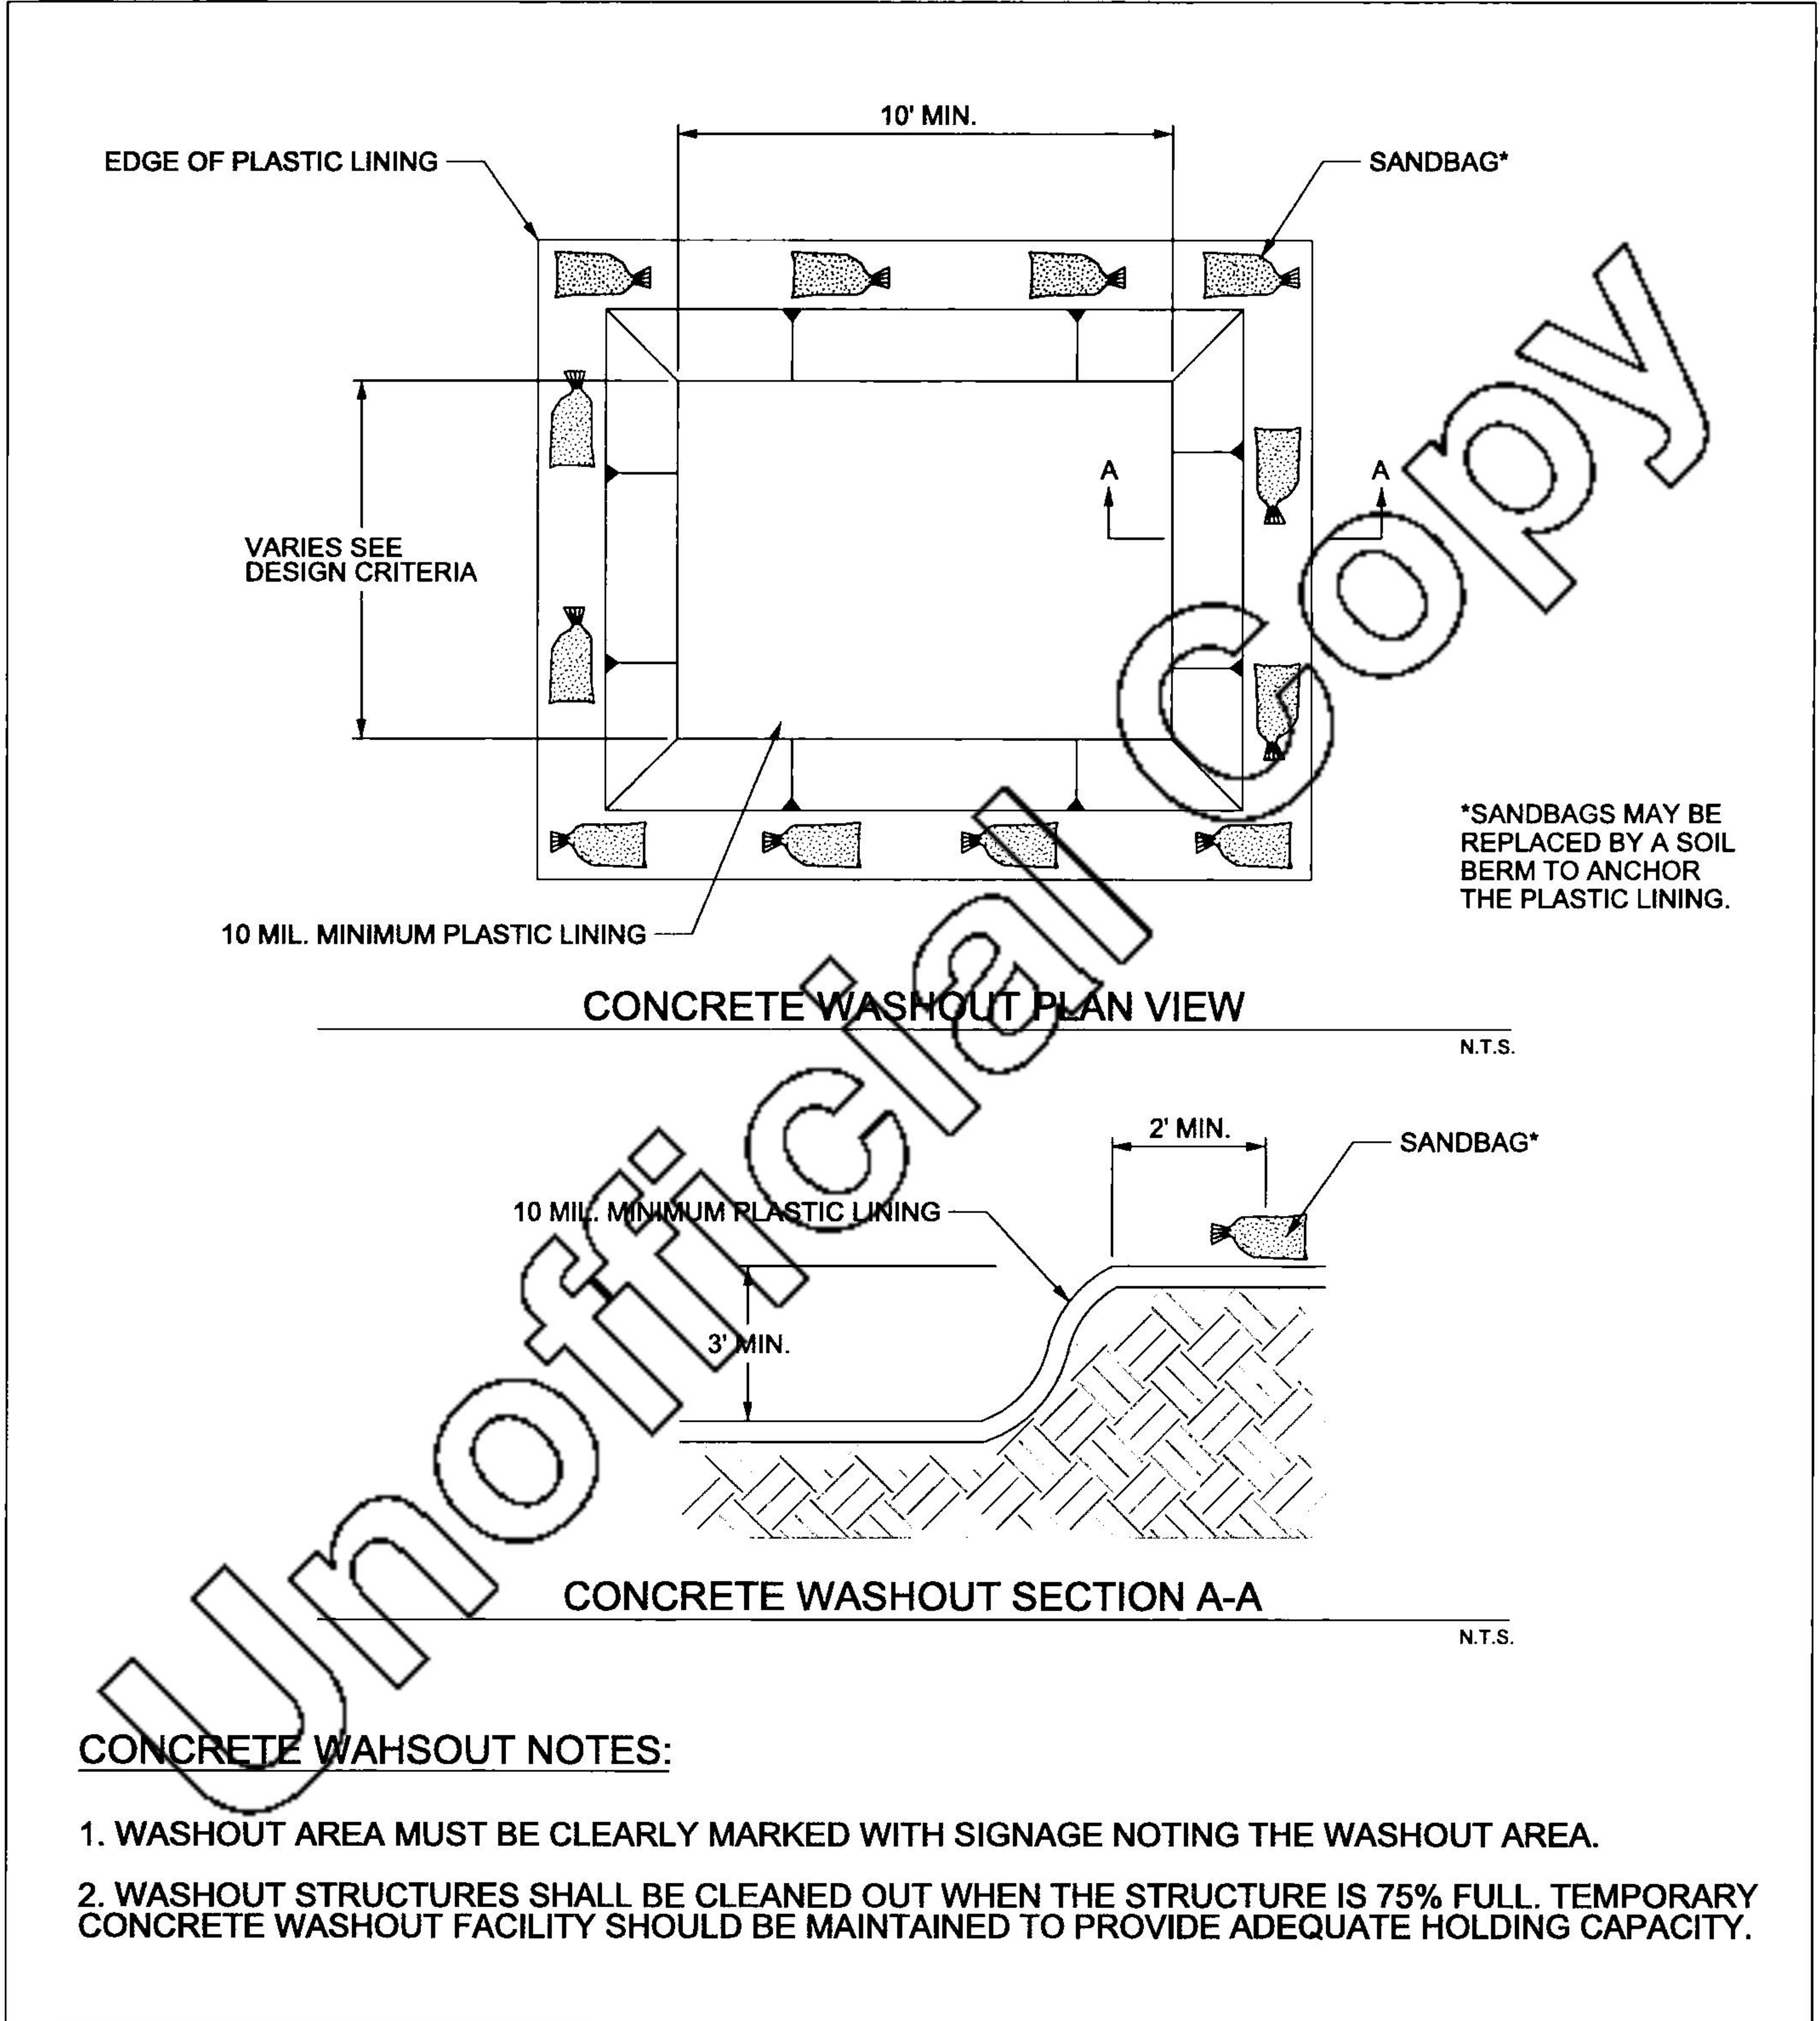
SCHEMATICS OF CONCRETE WASHOUT CONTAINMENT
